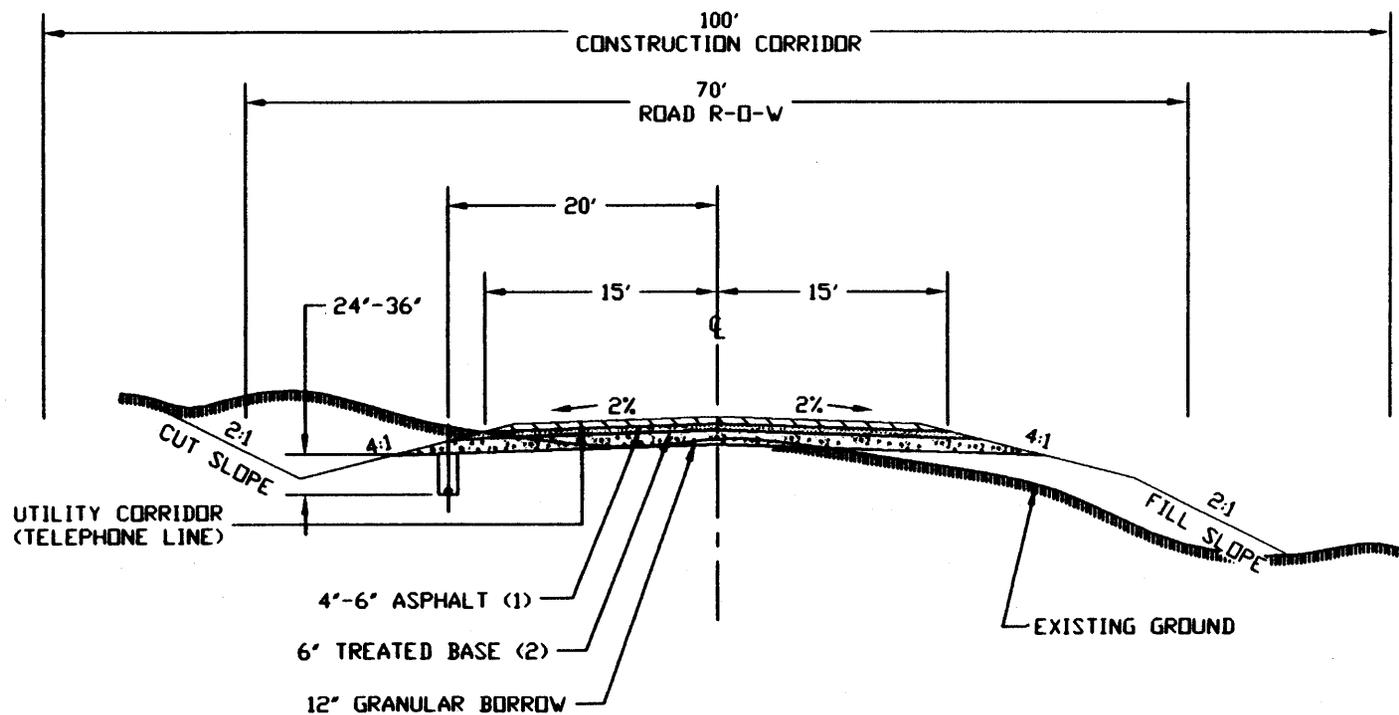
is a typical cross-section of the proposed coal haul road. Twelve inches of granular borrow would be used for the sub-base. The base course would consist of six inches of enzyme treated mineral aggregate. This well graded gravel would have a maximum size of one inch. The enzyme treatment would help stabilize the road surface and reduce dust emissions. The 30 foot graveled surface would be wide enough for future asphalt paving. Upon completion, an enzyme armor coating would be applied to the proposed road.
